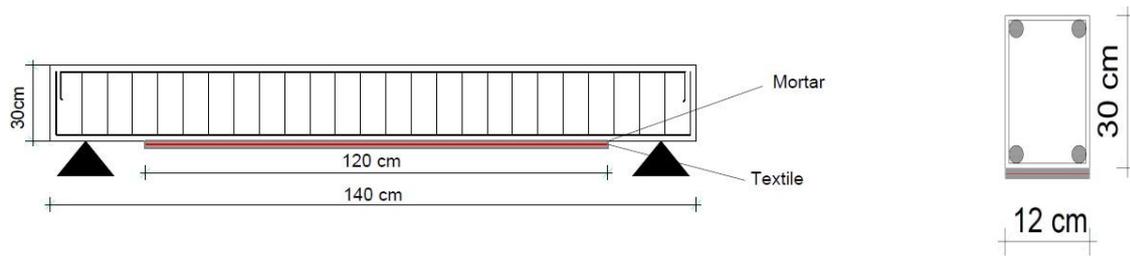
Longitudinal and mid span cross-section of strengthened specimen
